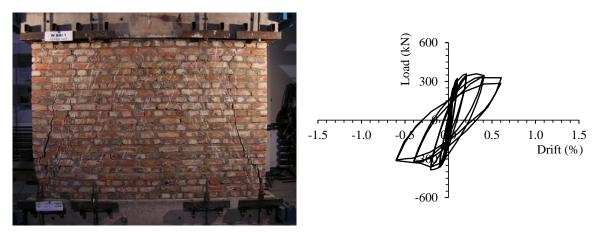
Hysteretic response of an unreinforced masonry specimen previously tested at CERS
